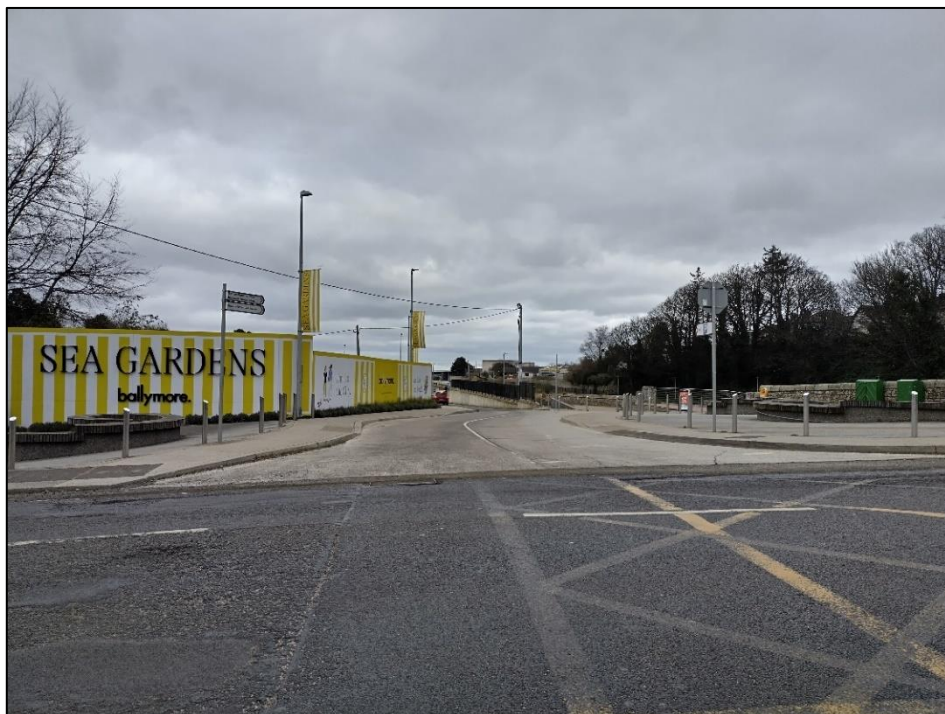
View of entrance to proposed development from Dublin Road, facing northeast
